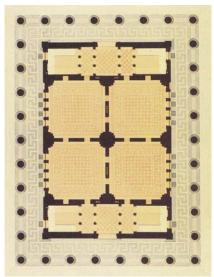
"Plan of First Story, Main Building by T. U. Walter (Girard College History Collections)
